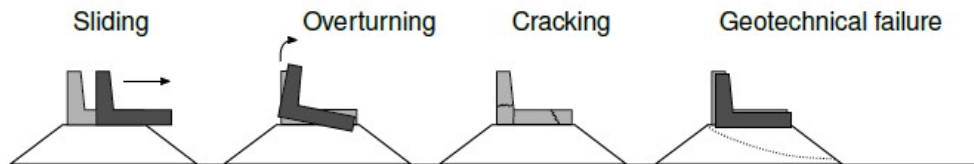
Crown wall failure modes (Pedersen, 1996).
